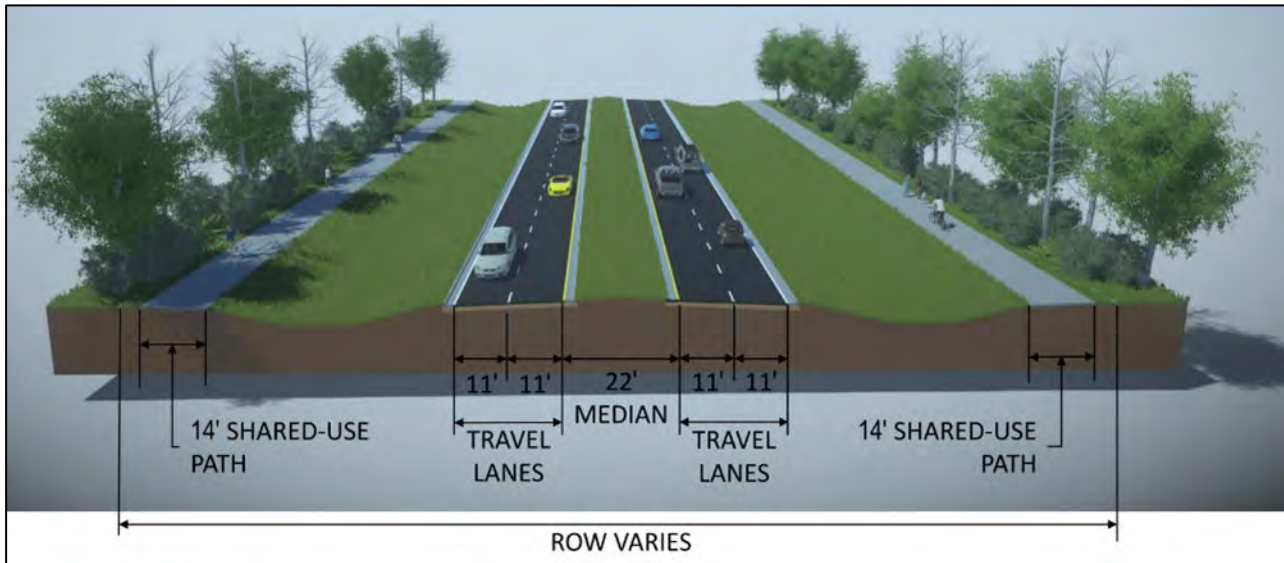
Segment 3 Typical Section (Cox Road to London Boulevard)
